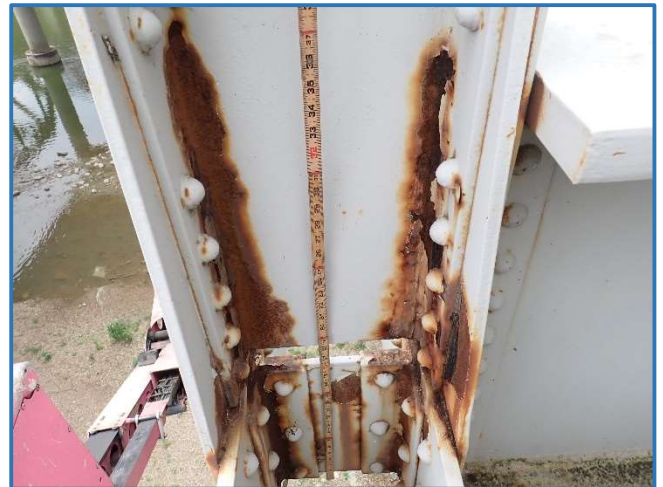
Active corrosion with section loss along flanges and web of vertical member in Span 2, South Truss, at Panel Point 9, looking west
